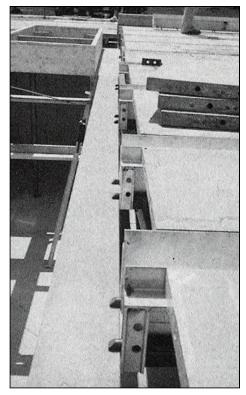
Deck forms are supported on collars of the rib forms, while rib forms are supported by retractable pins that bear on the foundation wall and on a steel center beam.
